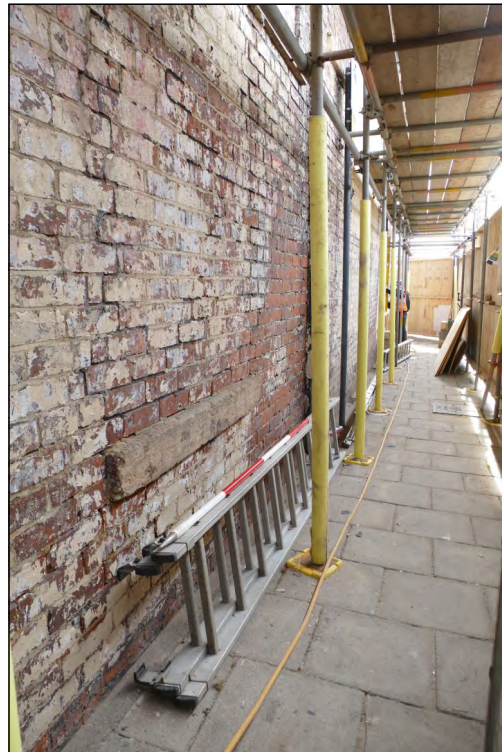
Ground floor exterior, view looking SSE along the west elevation from near the NW corner.
